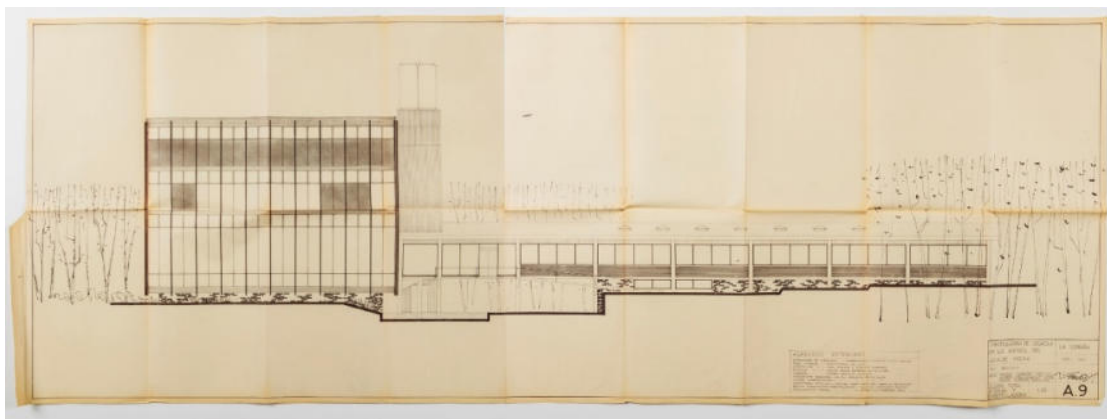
Coca-Cola bottling plant in A Coruña. Total elevation, offices and bottling plant, 1960.
